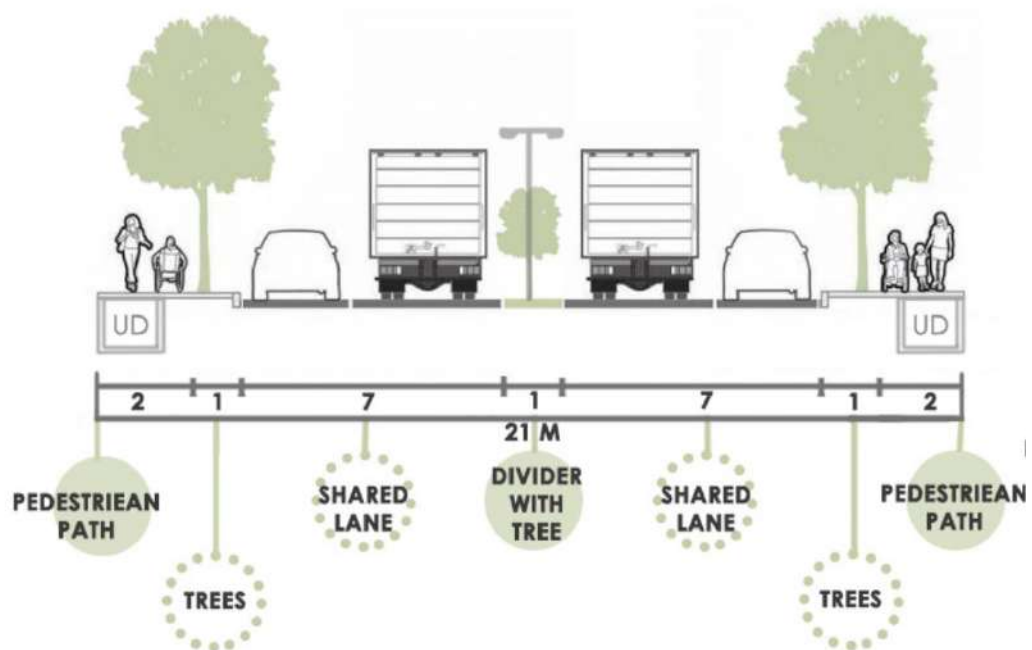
Typical layout of proposed 21m road (All Dimensions in meter)
